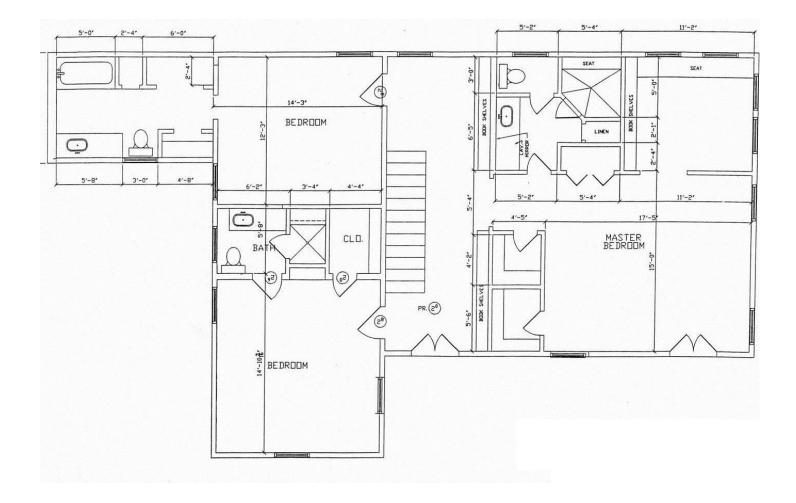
Second floor plan, existing. (Adapted from the electrical plans prepared in 2003.)
